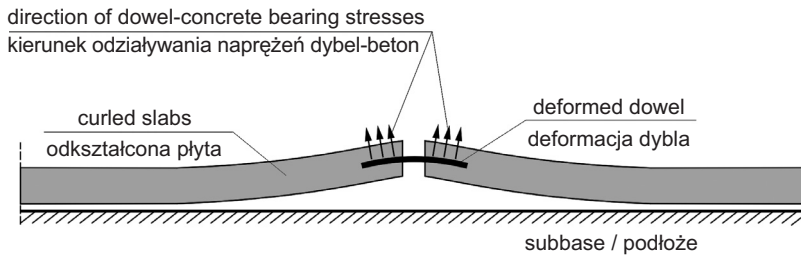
Distortion of a slab due to curling in concrete pavements with doweled joints [26]
